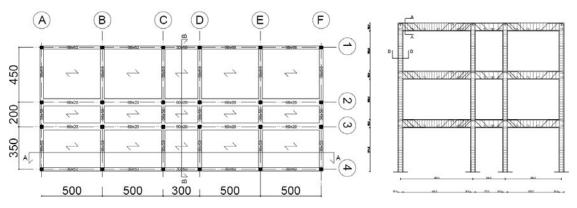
Plan view of the selected structure floor type, transversal section and reinforcements' details.
